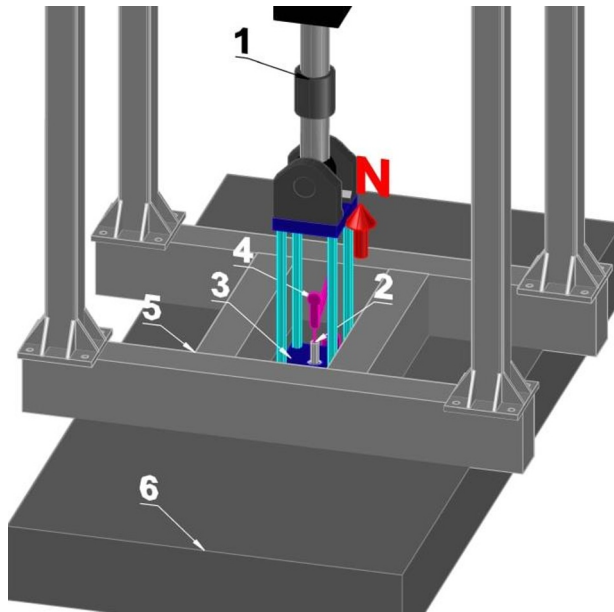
Anchor loading setup. – 1 – hydraulic jack, 2 – anchor, 3 – fixture, 4 – displacement transducer, 5 – loading rig, 6 – concrete base
